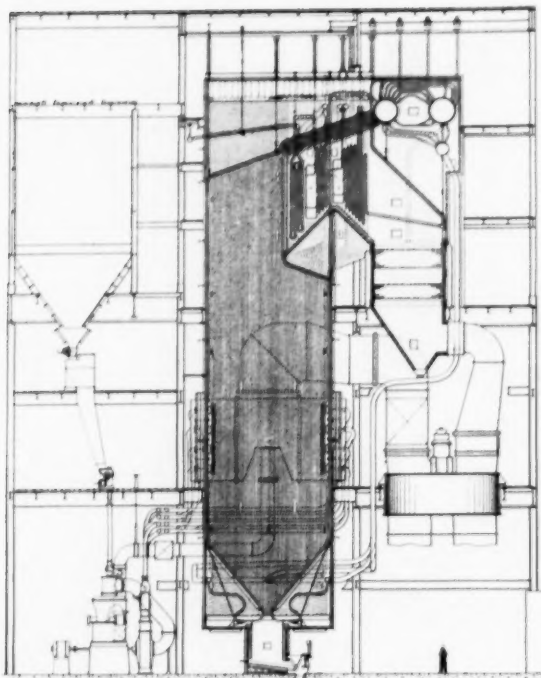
COMBUSTION BOILER UNIT, PLANT YATES, GEORGIA POWER COMPANY WITH INVERTED-TYPE AIR PREHEATER
